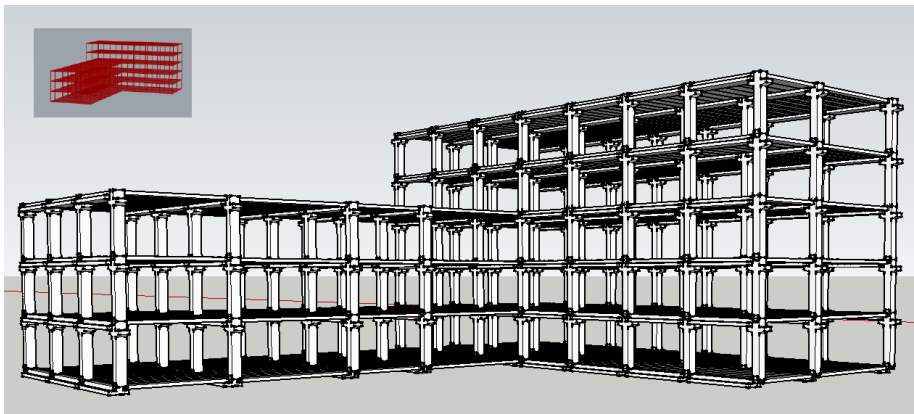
Transformation of the grasshopper wire frame to a frame showing the structural elements.
